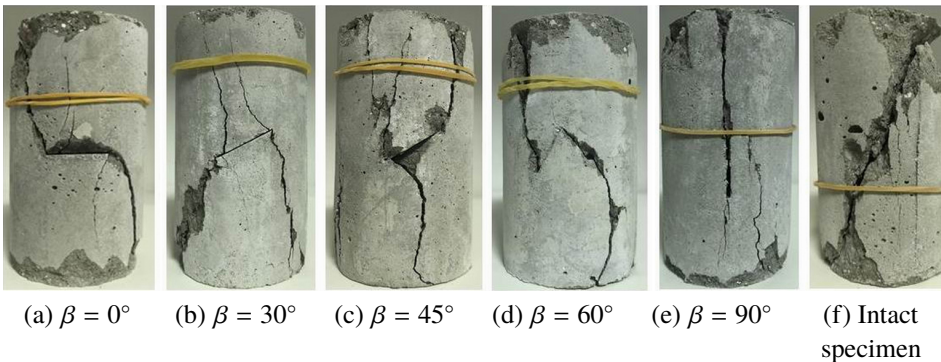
Fracture diagram of specimen during uniaxial compression test
